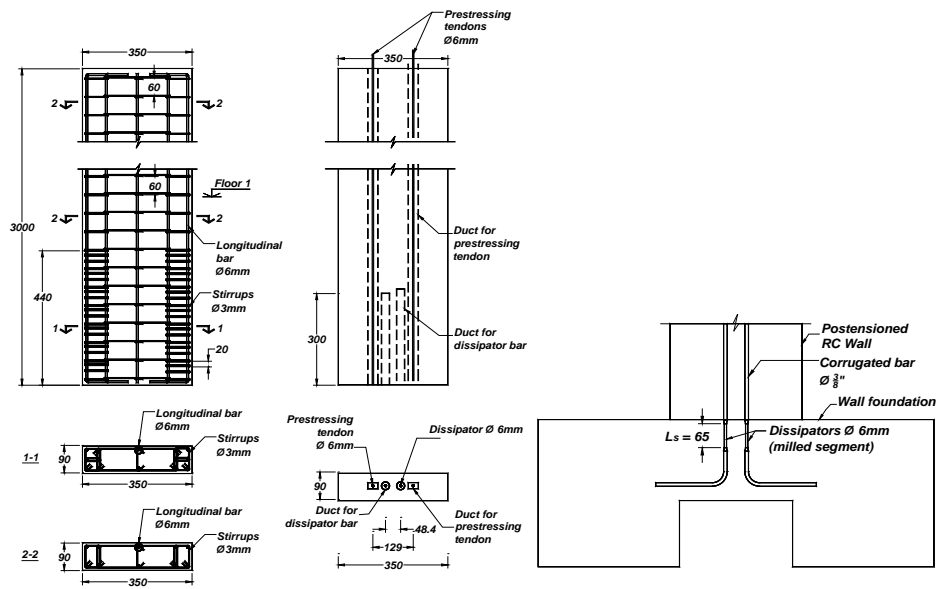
Test unit A1, dimensions in mm. Wall's transverse sections and reinforcement details.
